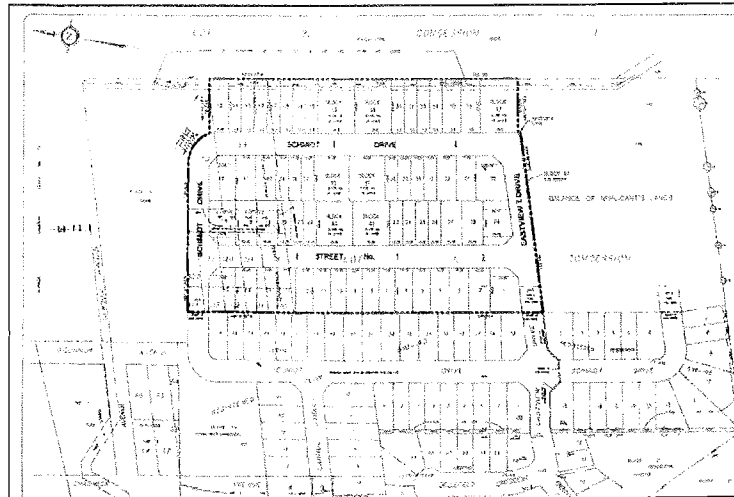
Proposed Draft Plan of Subdivision 23T-13001
